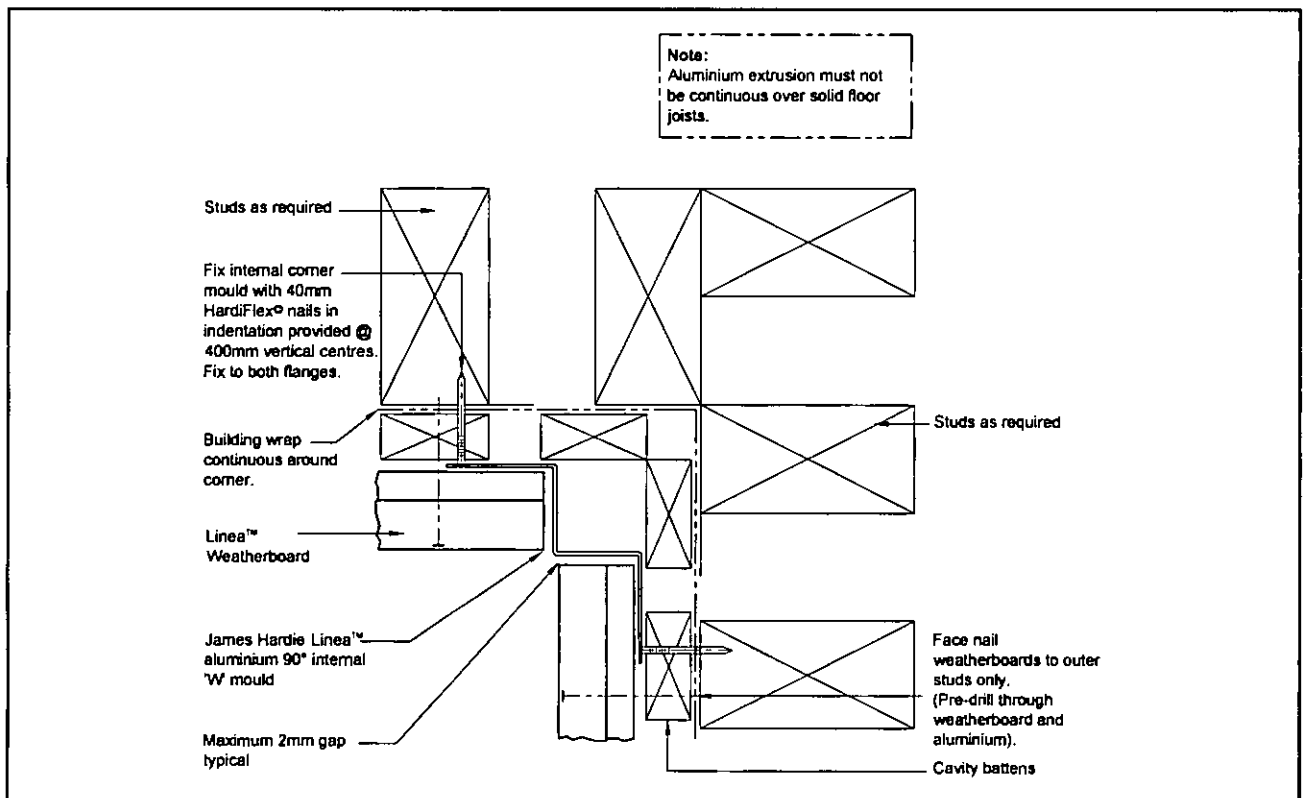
CAVITY INTERNAL 90° ALUMINIUM 'W' MOULD CORNER
